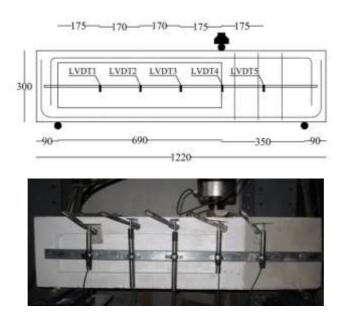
Beam configuration, test setup and position of the LVDTs (dimensions in mm)
